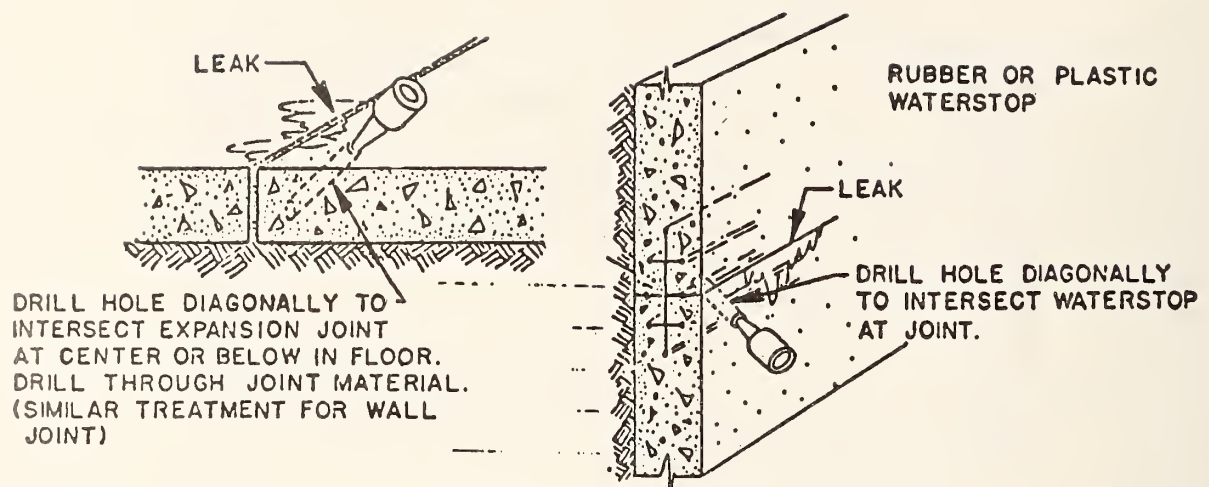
Repair of Wall Defects - Cold Joints (Ref.69)
